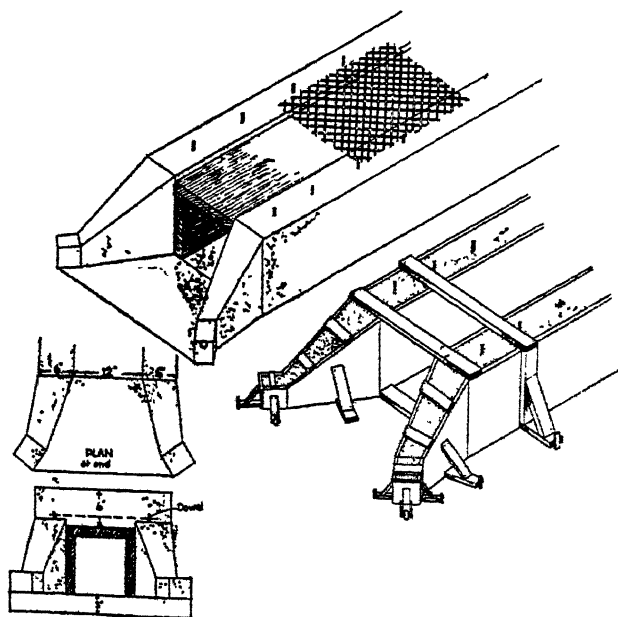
DIAGRAM SHOWING CONSTRUCTION NECESSARY FOR BUILDING A SQUARE CONCRETE CULVERT.
